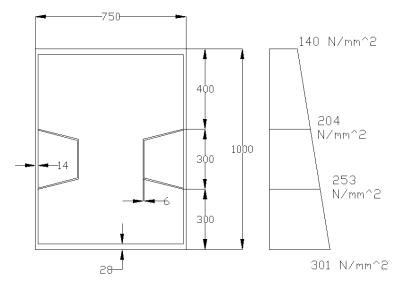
Cross-section of the main-girder with stiffeners and stress distribution.
